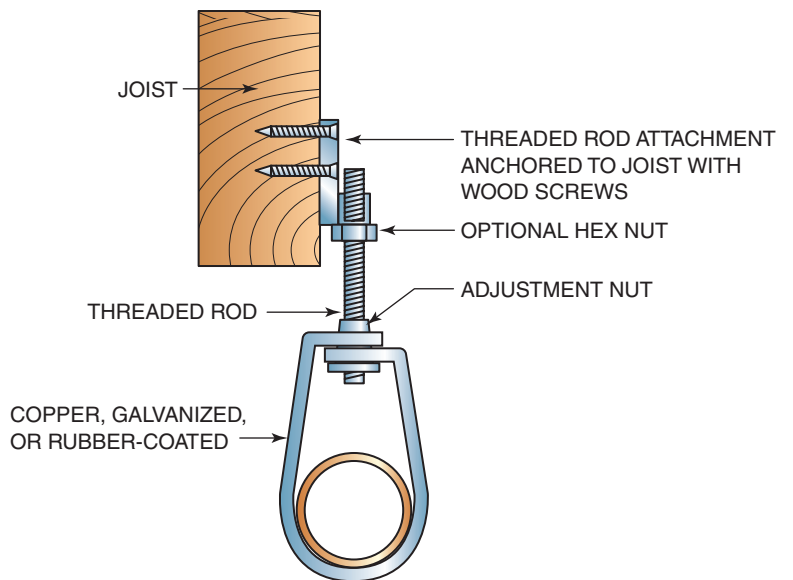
A threaded rod attachment is used for wood structures; an adjustable swivel ring hanger is another common type used for installing horizontal piping.
